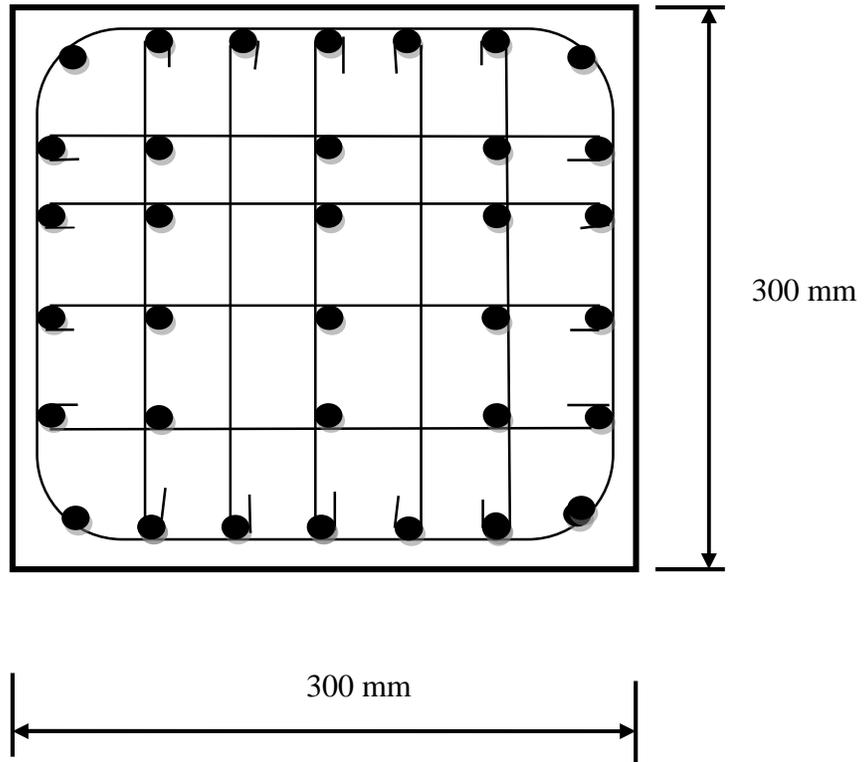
Cross-Section of the Mangrove Reinforced Concrete Column
